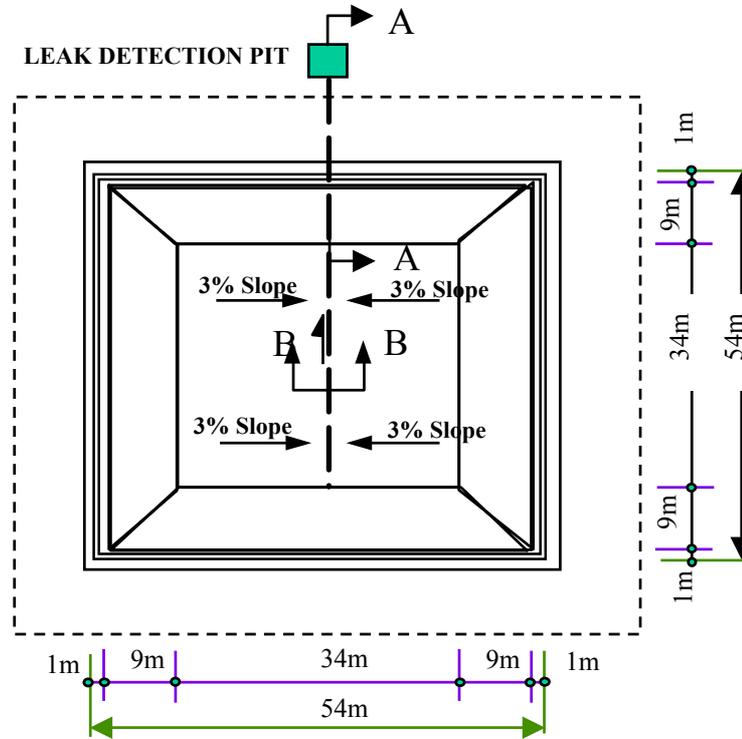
Plan view of the landfill constructed in the Eastern Province.
